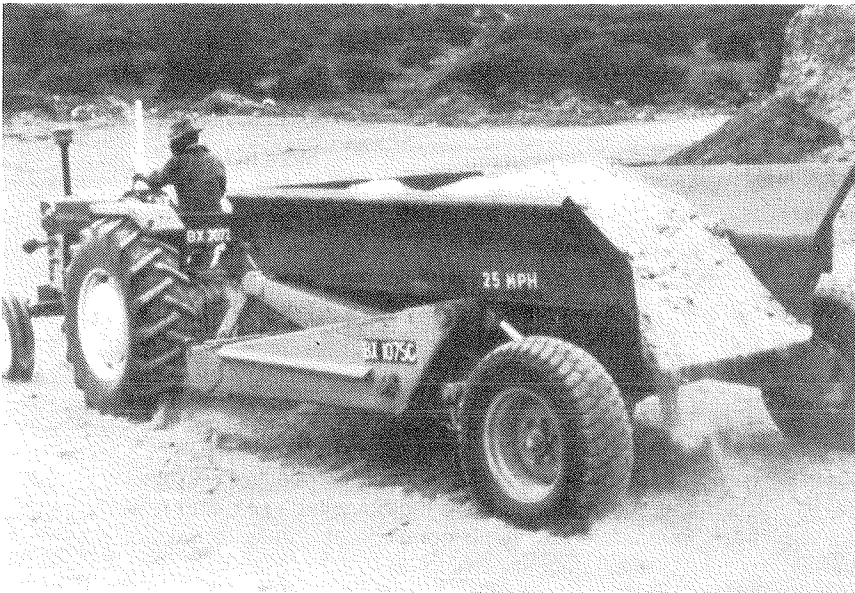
Alternative modes of haulage in low-volume road construction (7).
